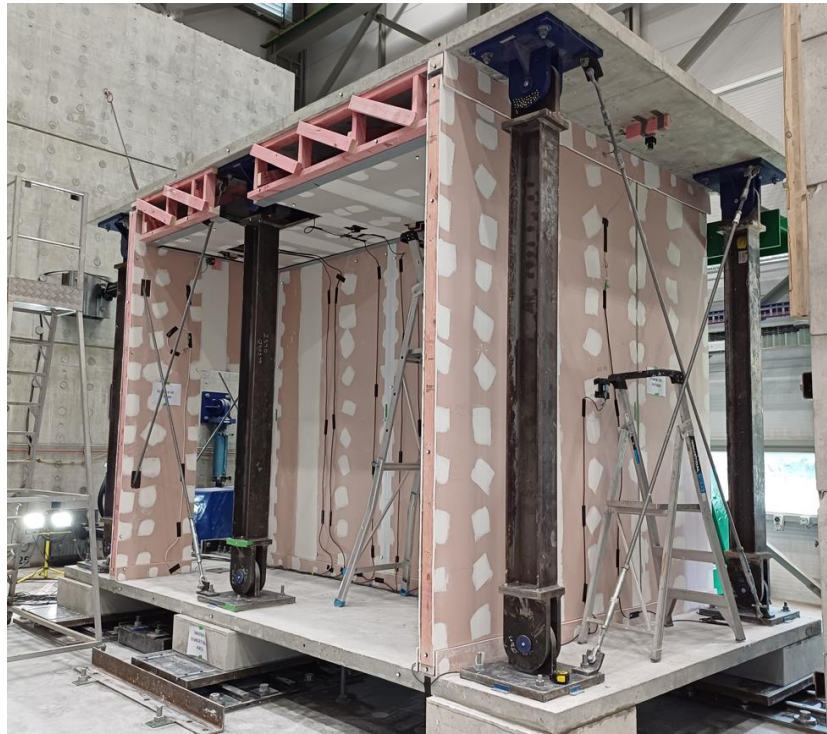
Photo of constructed specimen (Northeast elevation)
